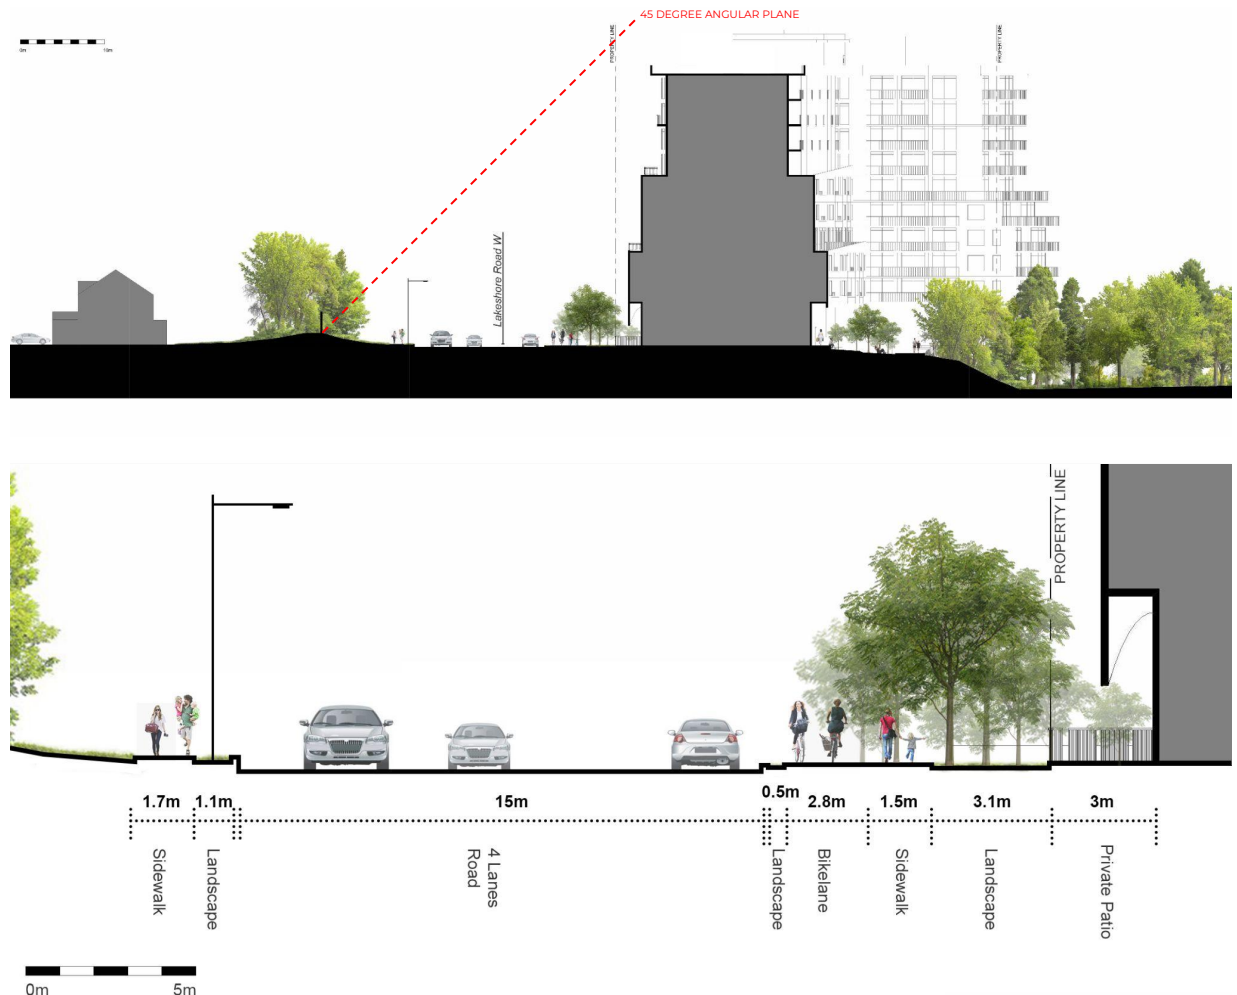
Site Section (top) and Streetscape Section (bottom)
